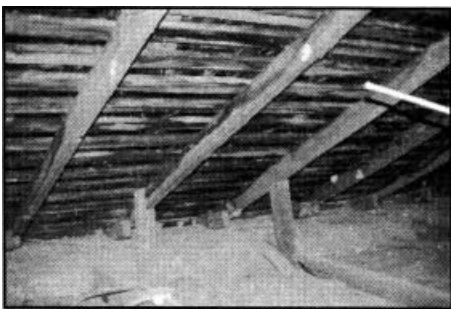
Roof framing shown in the attic. The roof rafters and the porch rafter sit on top of the top course of adobes. The ceiling rafters are supported by the second course of adobes with adobe blocks between the joists.
